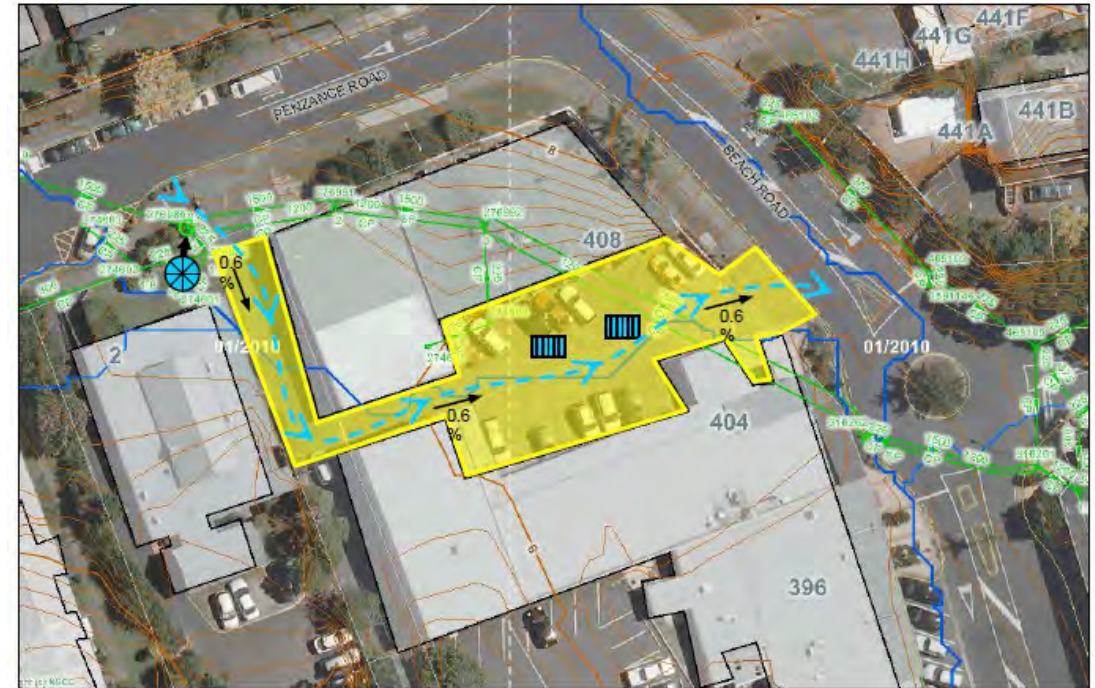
Modelled Penzance Road to Montrose Terrace culvert
